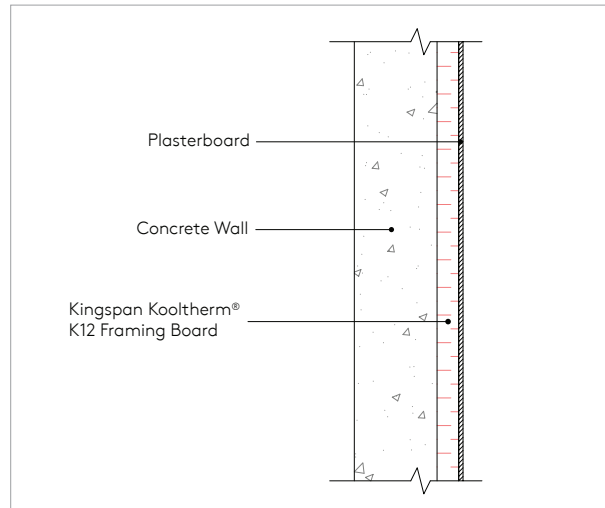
Side elevation of Kingspan Kooltherm K12 Framing Board mechanically fixed to the concrete wall.
